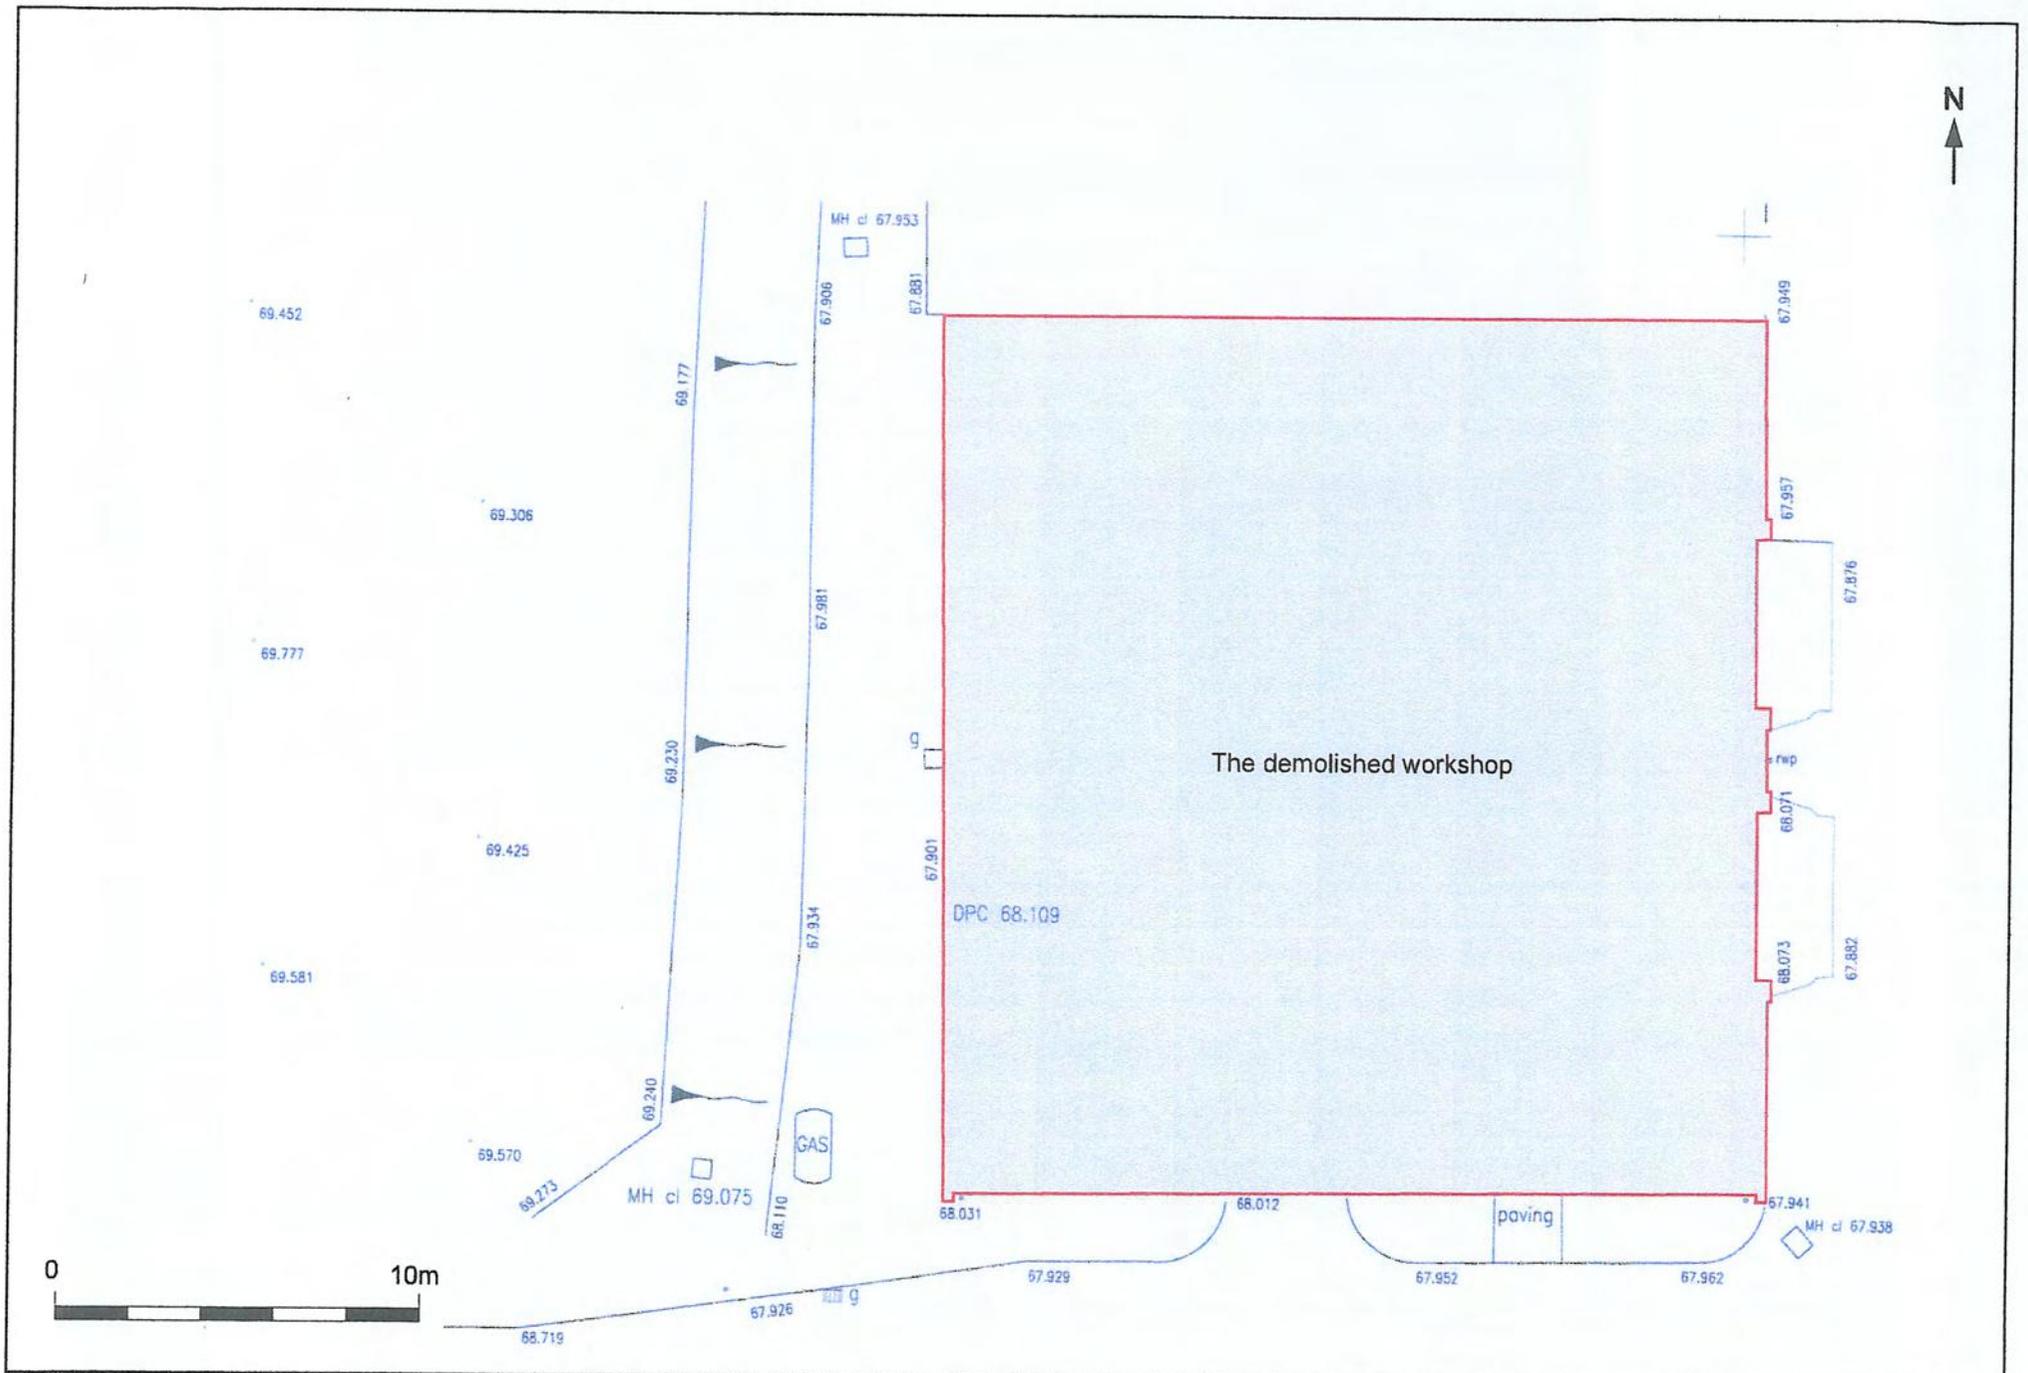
Site location plan (b) showing demolished workshop, adjacent bank and levels prior to watching brief
